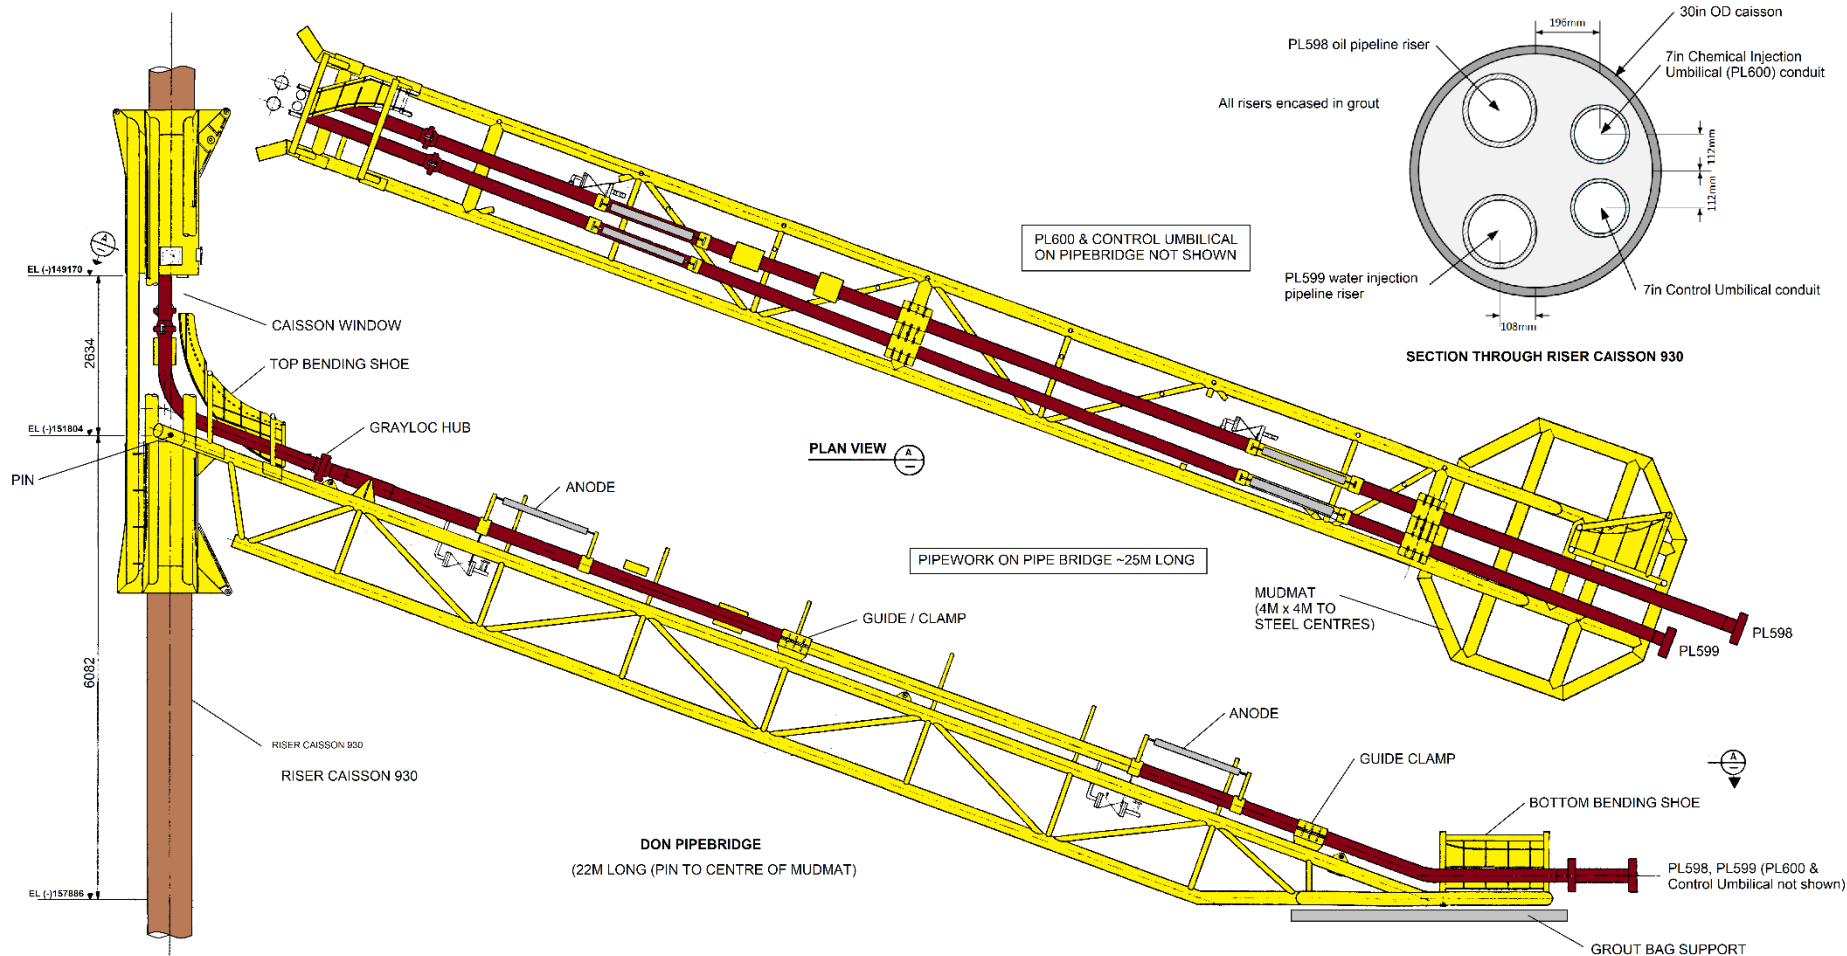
Don pipebridge (next to riser caisson 930 on Thistle jacket)
